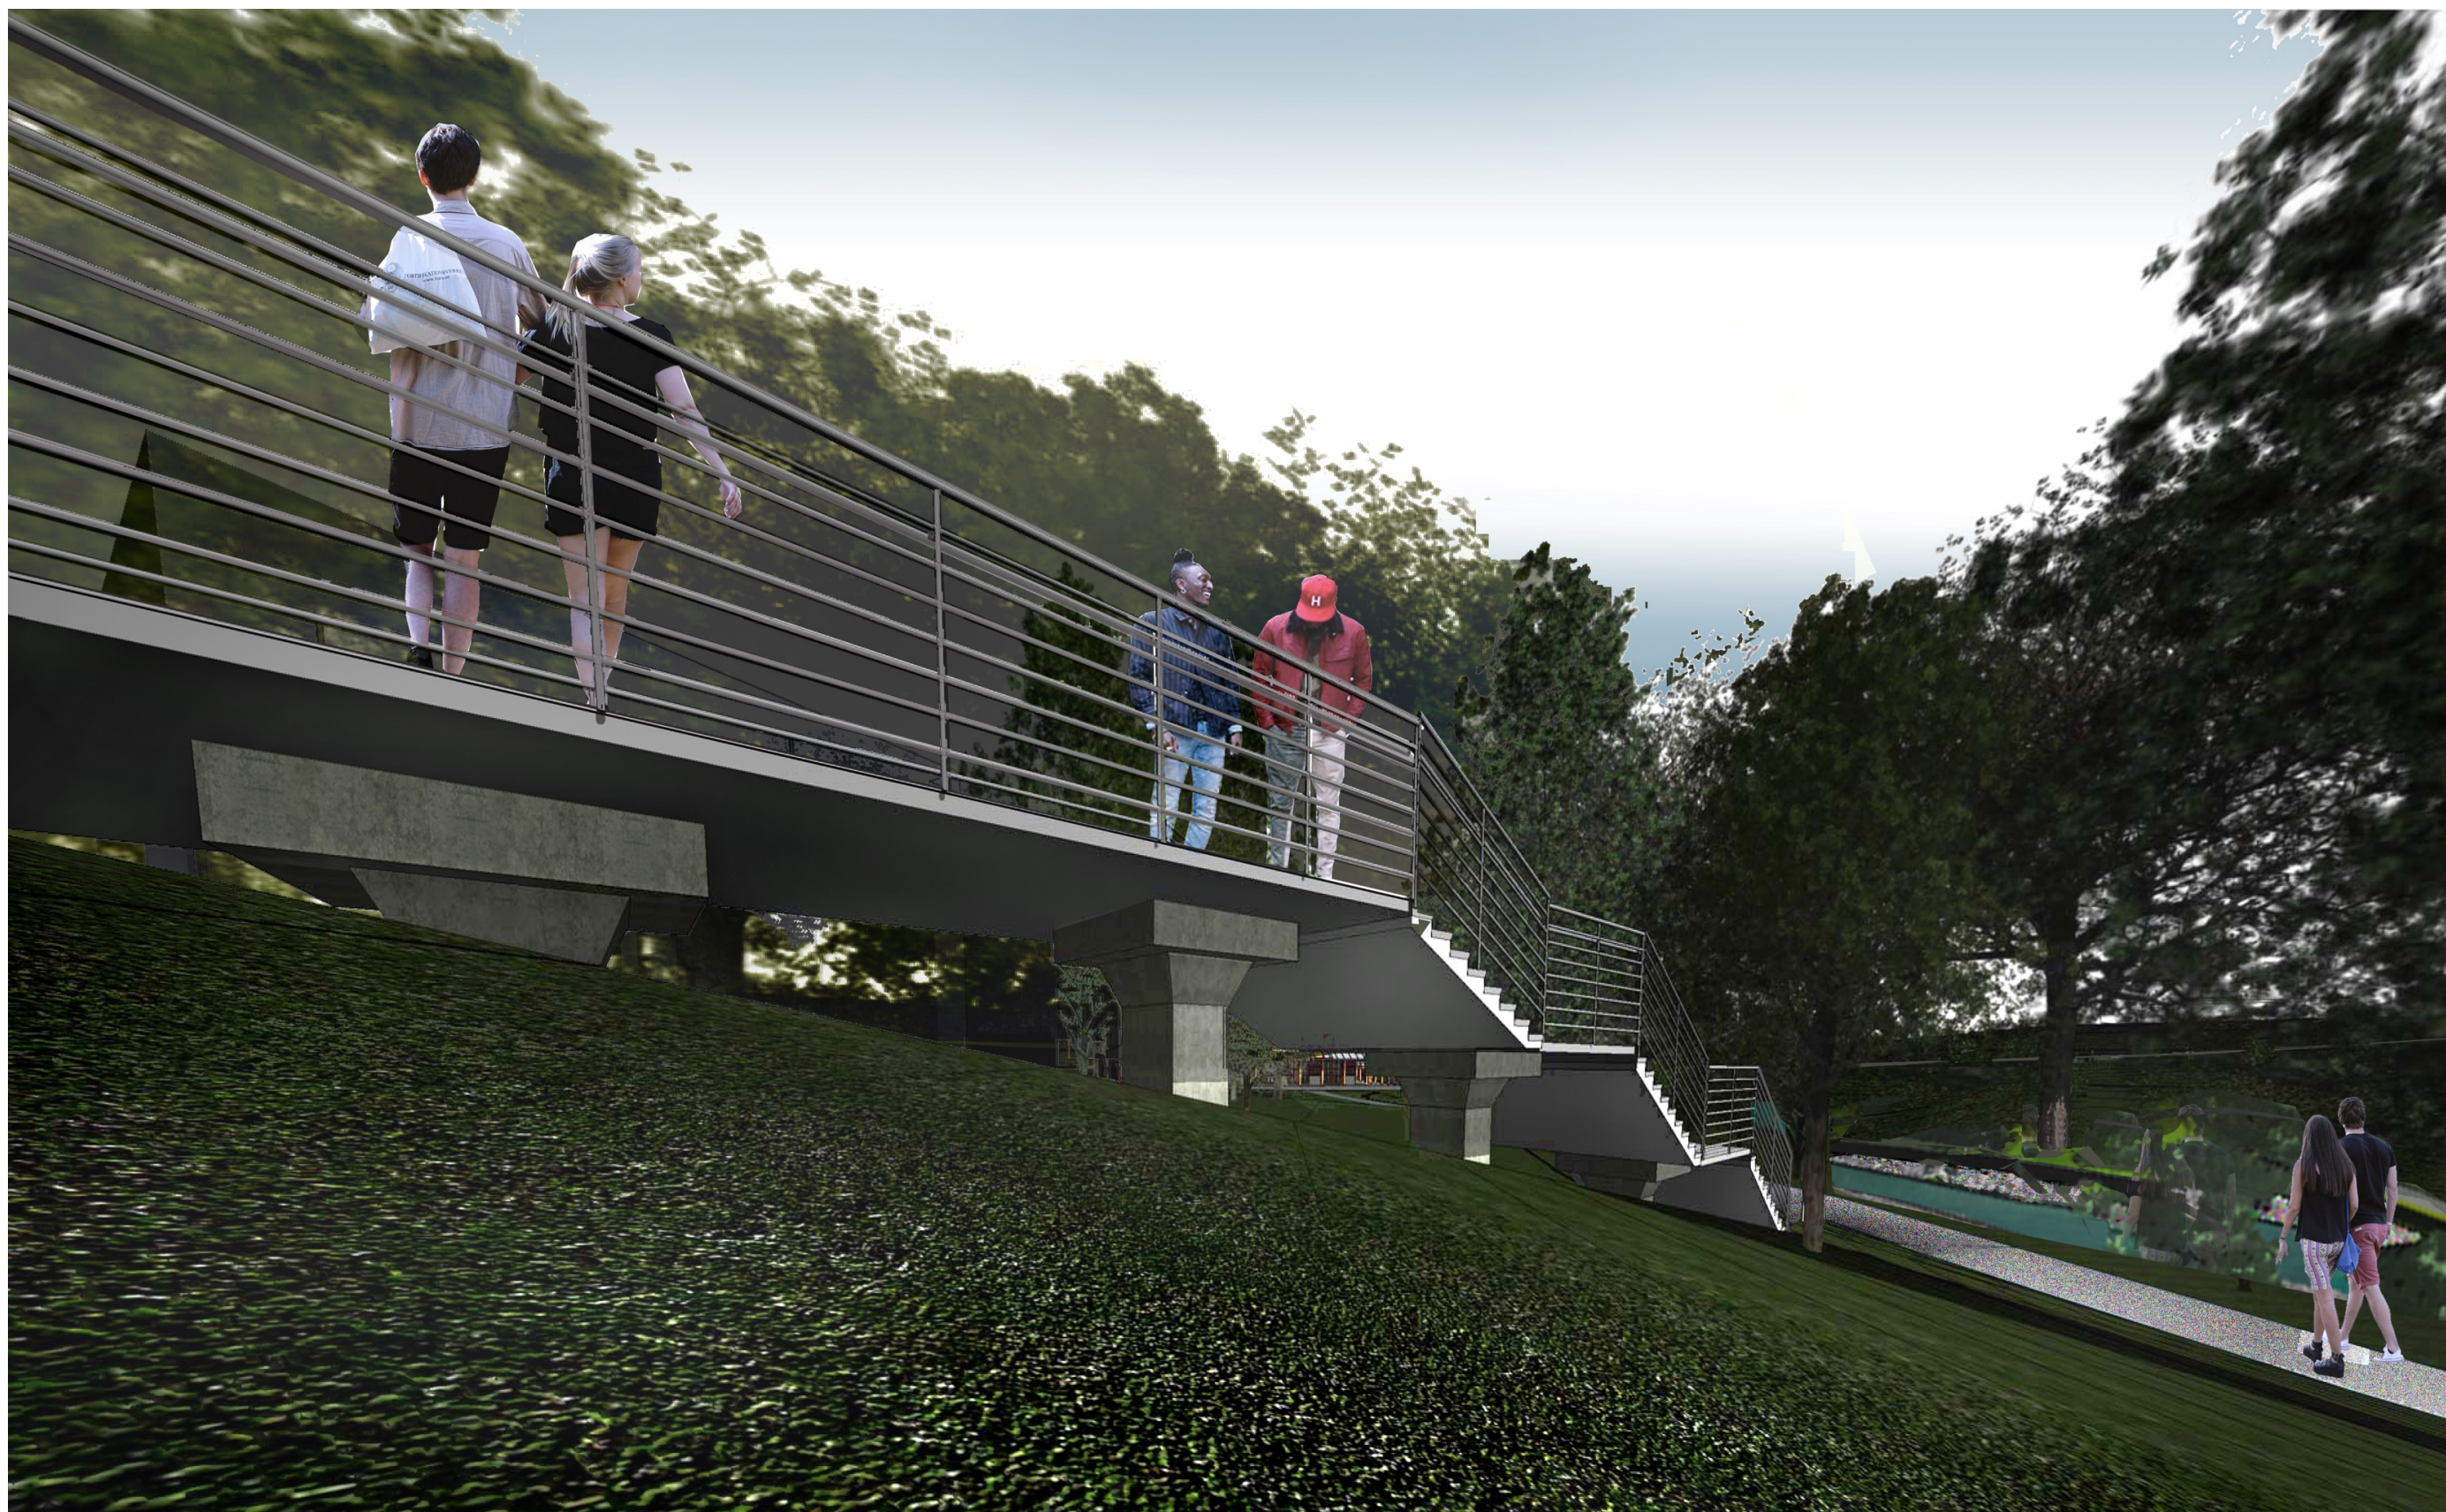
"Flying Bridge" stair from West Avenue/Mill Street. Rendering by J. Nicholson
